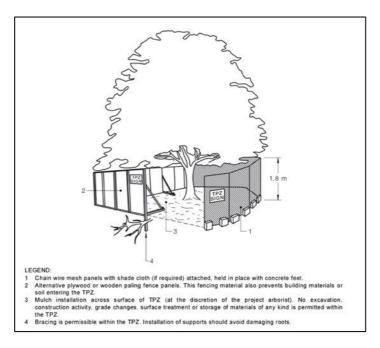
Example of tree protection fencing, taken from AS 4970-2009 Protection of tree on development sites.
